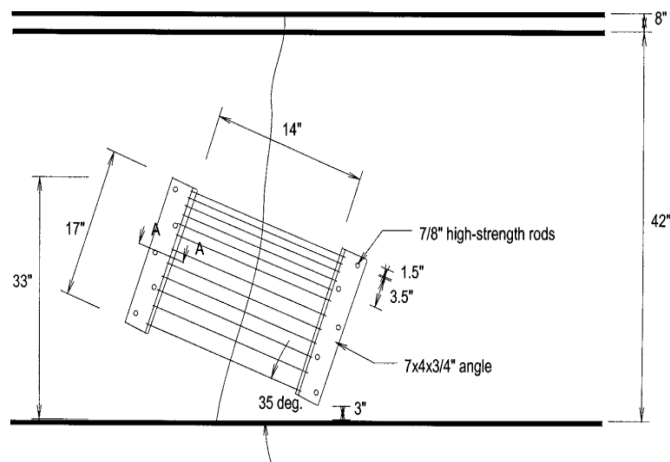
Schematic diagram for SMA rods used to control of shear cracks in a bridge girder [9].
